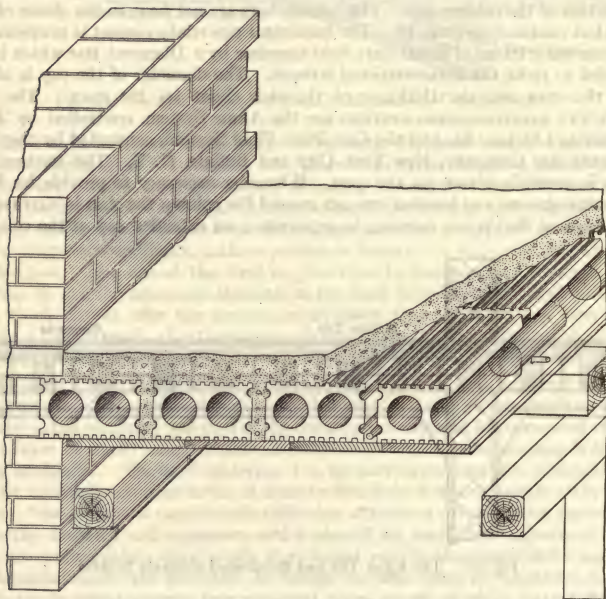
The Faber Two-way Tile and Reinforced-concrete System
